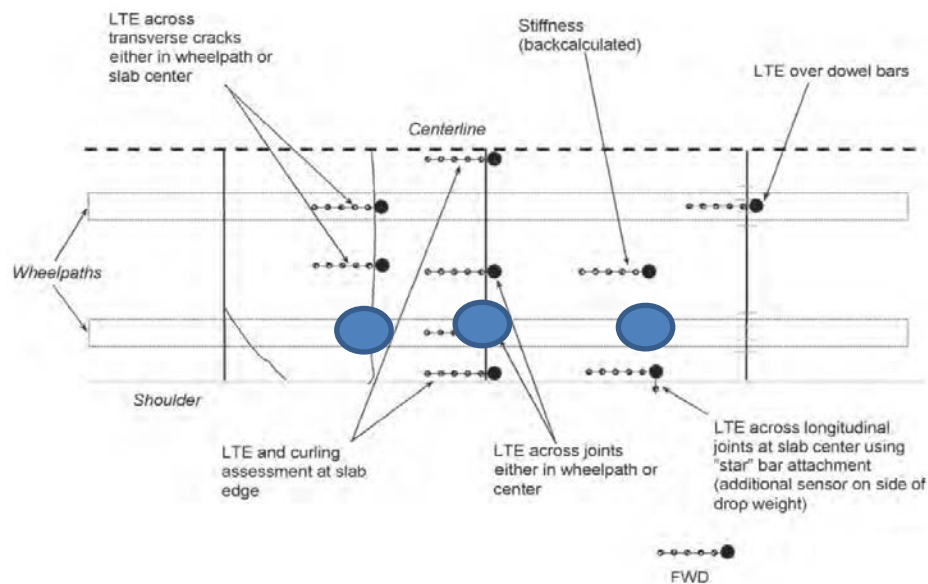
(b). Example FWD Test Locations on Jointed Plain Concrete Pavements.
